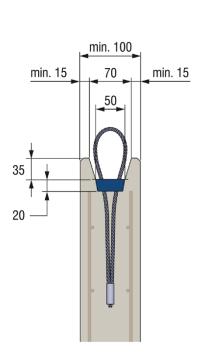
Wall - Wall - T-CONNECTION - detail with bended wire loops
